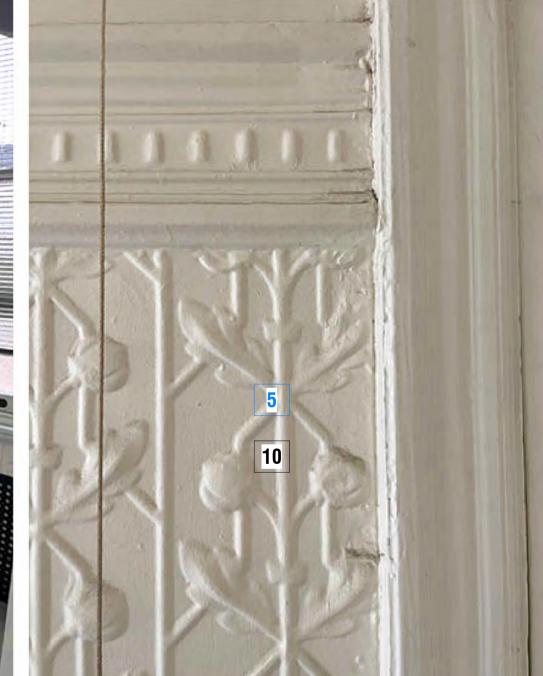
PHOTO - VIEW INTO CURRENT FIRST FLOOR BATHROOM
